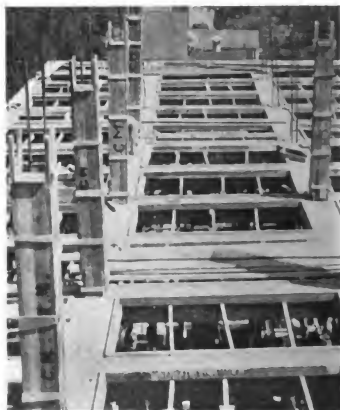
SKELETON CONCRETE BUILDING DURING CONSTRUCTION.
